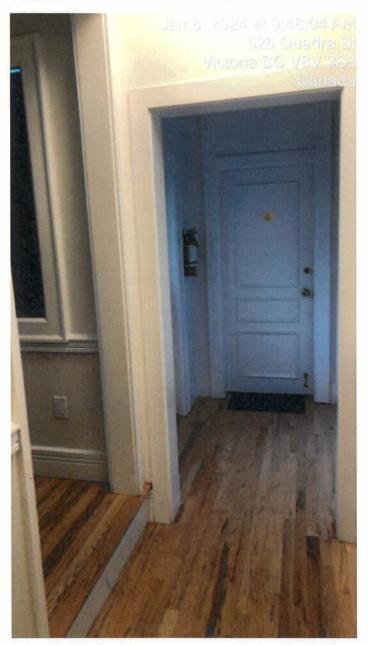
Humboldt St Matthew LINNITT_STR Inspection Main Floor Hallway_DUARTE_20240108
